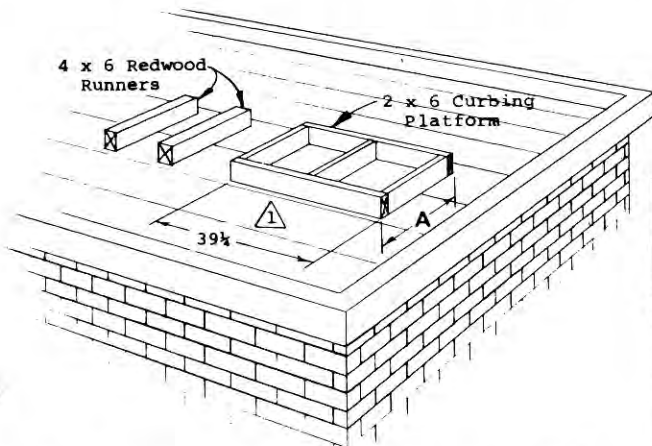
UNIT AND ROOF HOOD DETAILS
